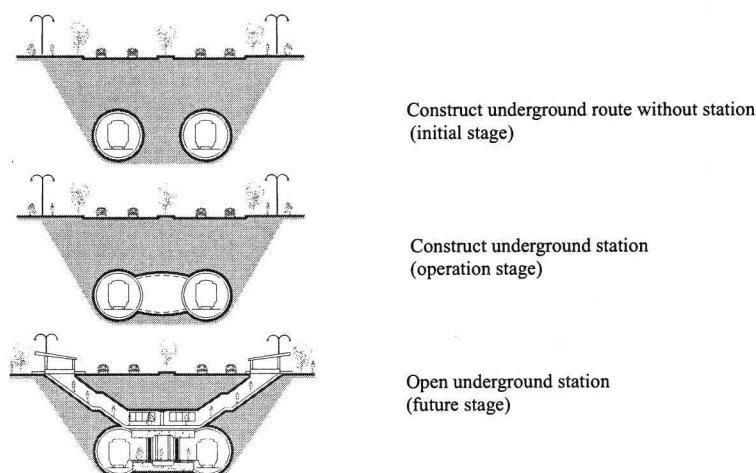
Alternative by Postponing Construction of Underground Station from Initial Opening Stage
